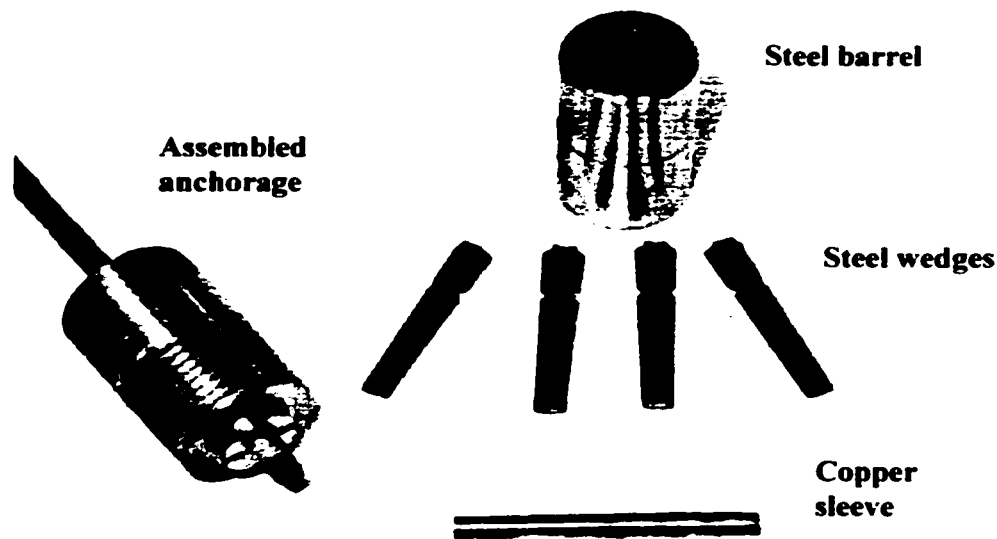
The metallic anchorage barrel, wedges, sleeve and assembled anchorage.
